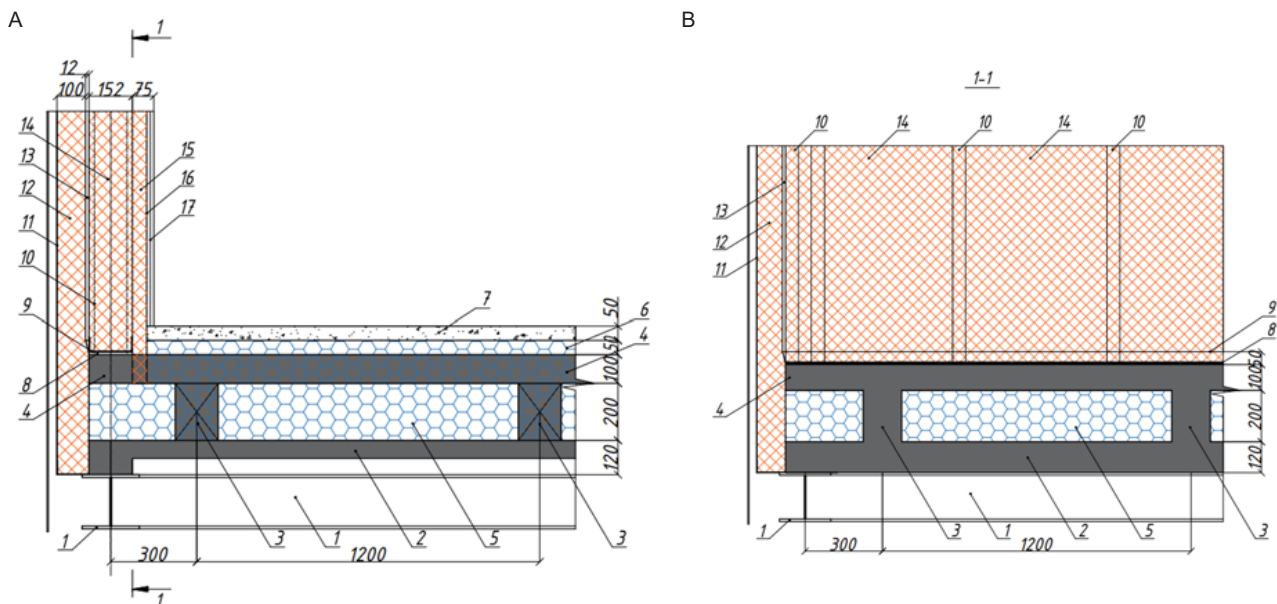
Heat-efficient solution for the corner section of an external wall-basement slab connection: 1 — foundation steel beams; 2 — reinforced concrete basement slab; 3 — beam supports; 4 — TB beam; 5 — EPS insulation; 6 — top layer of EPS insulation; 7 — cement-sand screed; 8 — polyethylene backing layer; 9 — guide steel profile; 10 — steel stud; 11 — weather barrier; 12 — external insulation; 13 — OSB board; 14 — LSF wall with glass wools; 15 — internal insulation; 16 — vapour barrier; 17 — gypsum plasterboards
